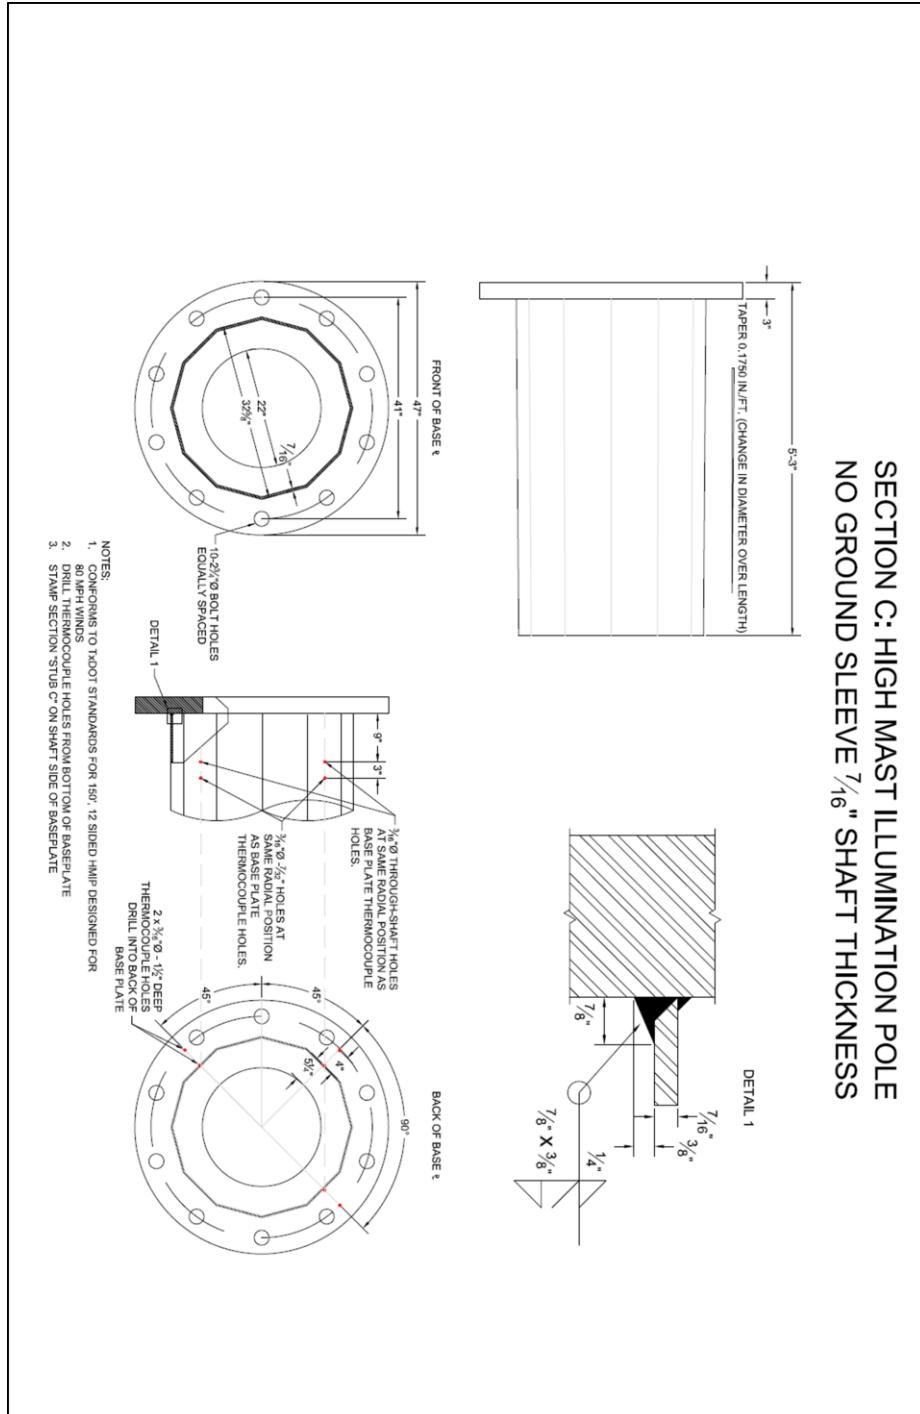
Design drawing for specimen 33-3-12-TX-SG-SA
